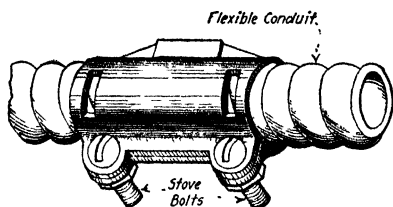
Coupling for flexible steel-conduit. (Thomas & Betts Co., New York City.)
